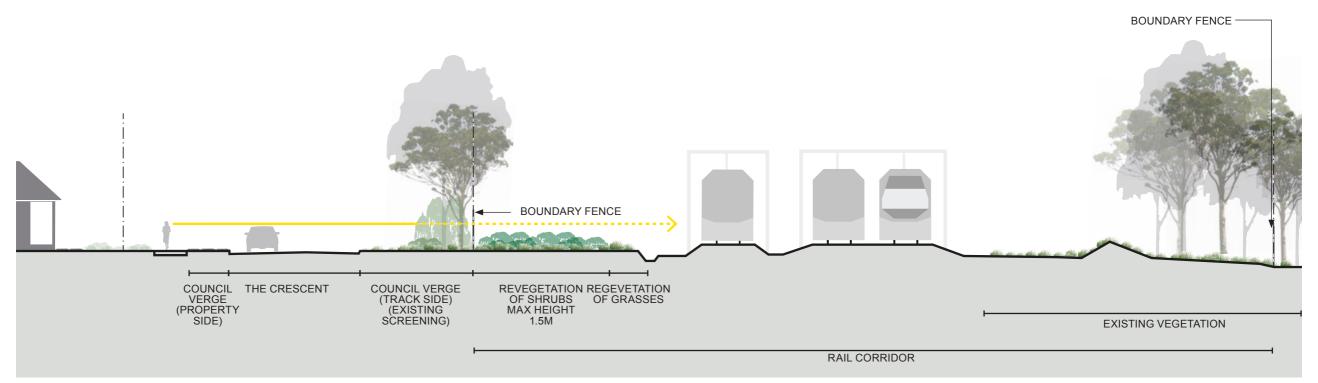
Typical cross section tracks level with the street at The Crescent
